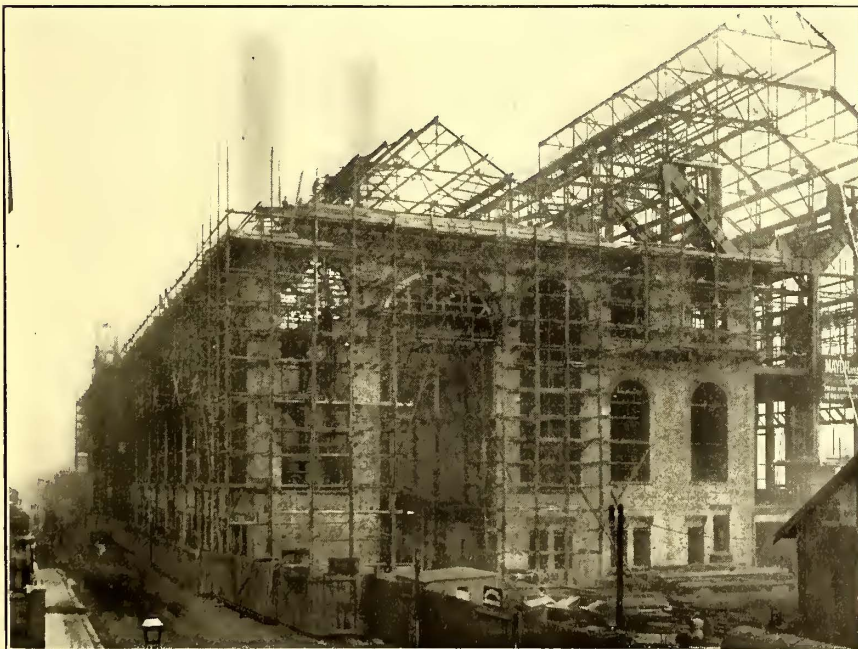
WEST ELEVATION OF CHELSEA GENERATING STATION
